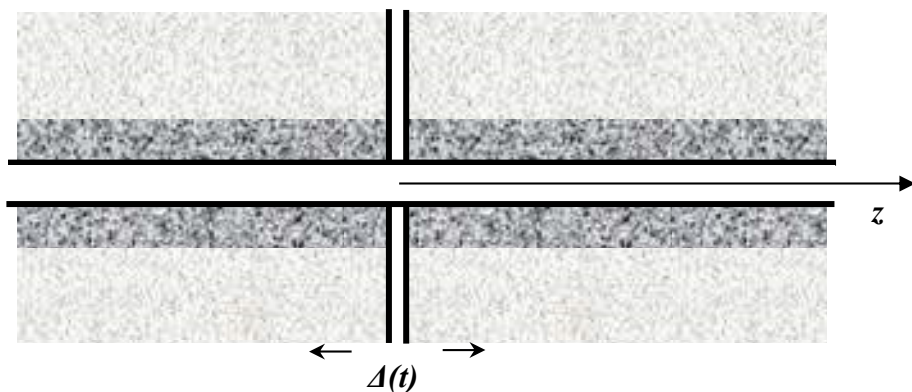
Scheme of buried pipeline on damaged fondation
